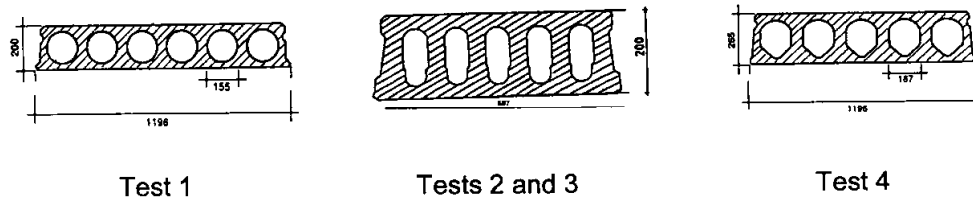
Cross-sections of the elements tested (units : mm)
